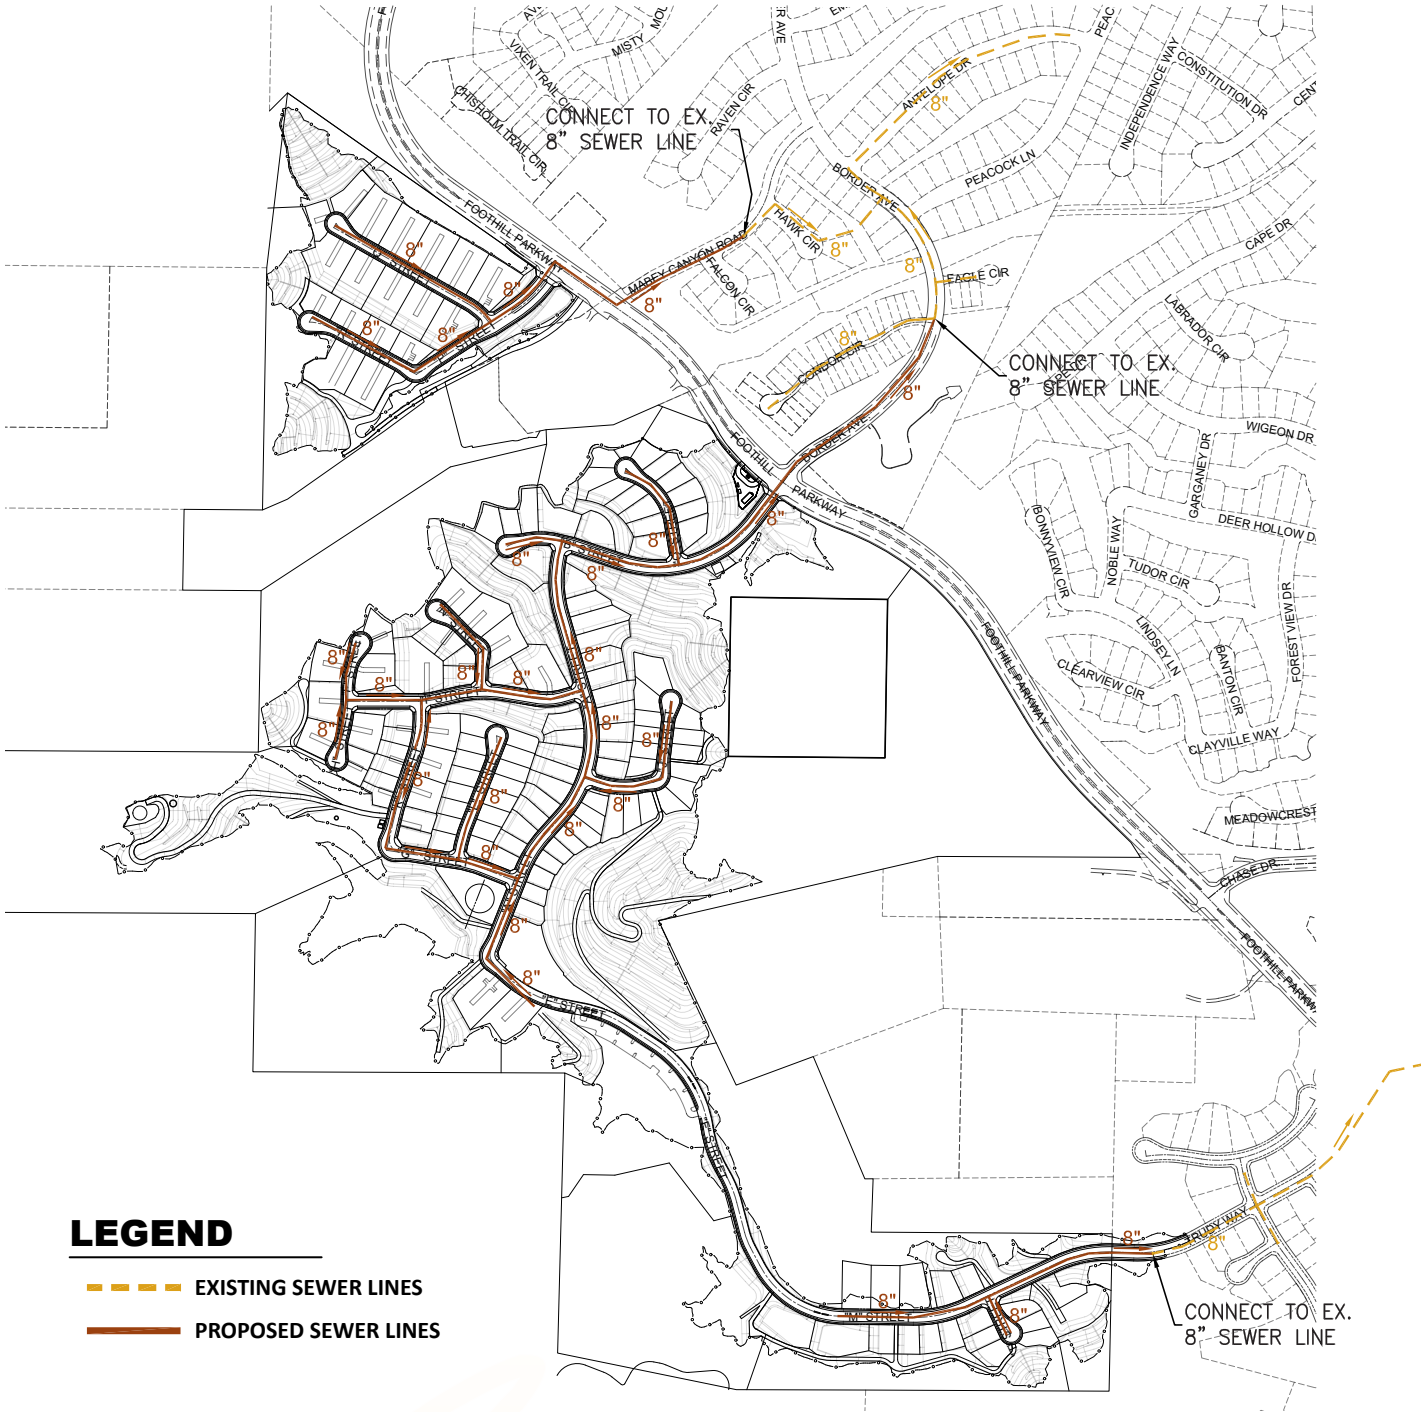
CONCEPTUAL WASTEWATER PLAN
